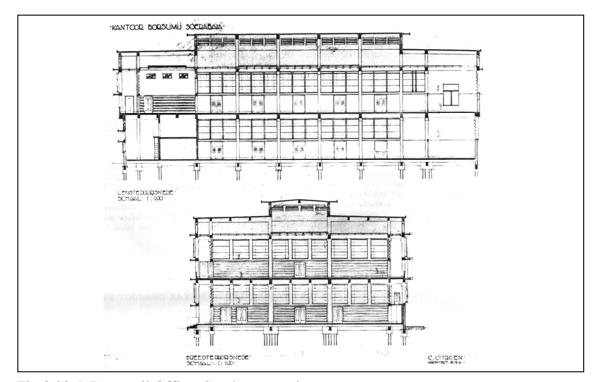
Borsumij Office, Surabaya: sections.
